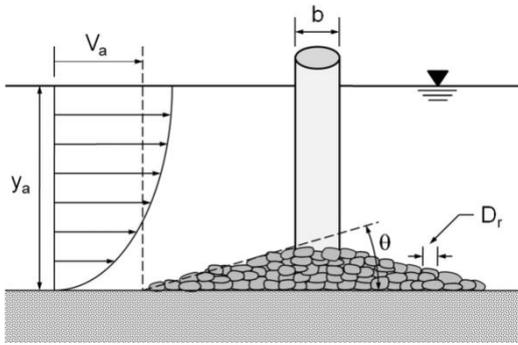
Schematic of the problem of sizing rock riprap to protect a bridge pier.
